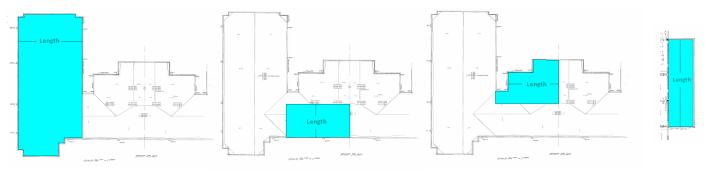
Four separate roof area in which their upper portion was modeled as wall sections
